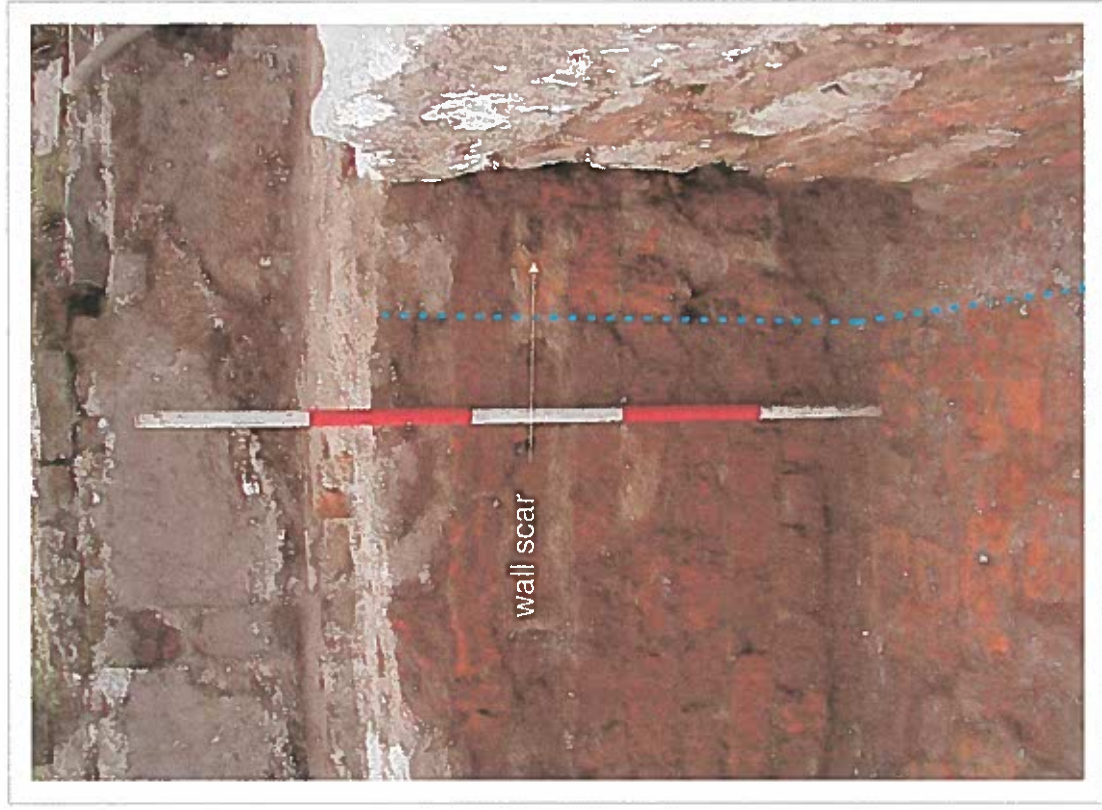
Detail of west end of inner southern arched wall, showing scarring from pre-existing N - S wall. (Edge of scarring is highlighted) (Scale 1m. looking south)
